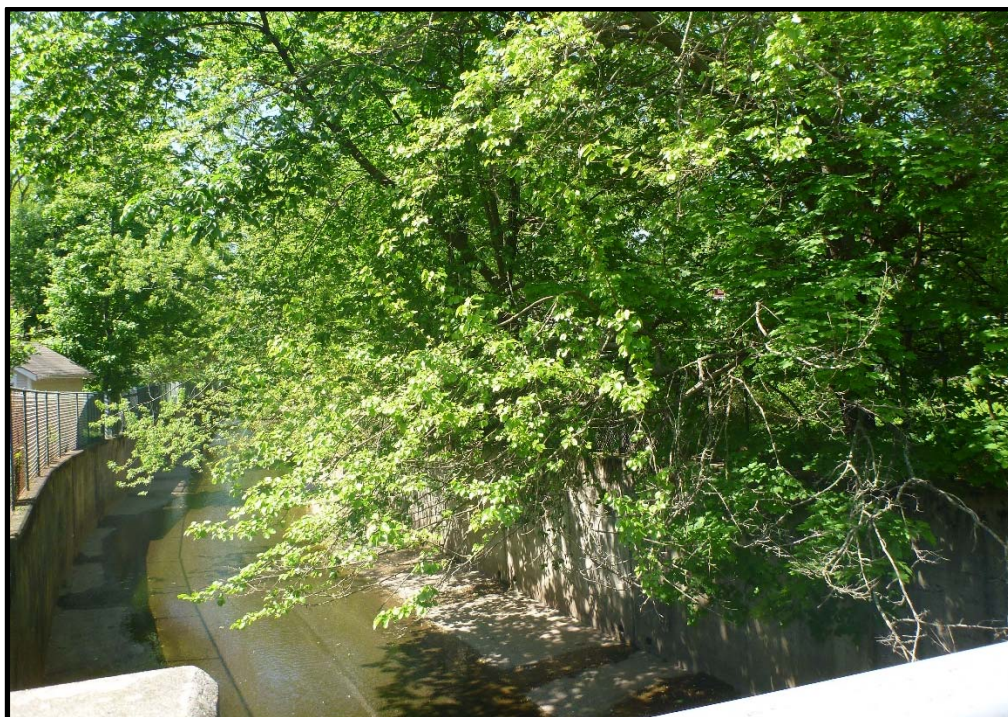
Example of Concrete Retaining Walls: Sheldrake River Near Waverly Avenue.
